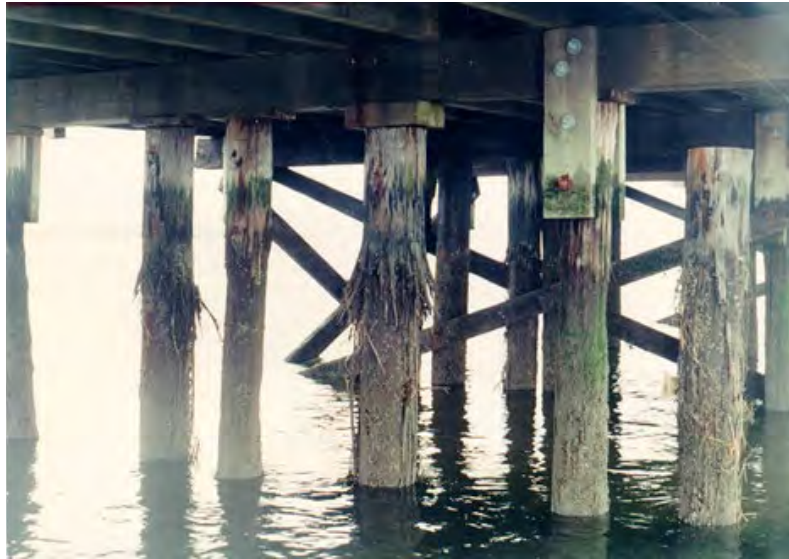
Timber Pile Bent exhibiting Freeze-Thaw Damage above the waterline. Also examples of shims, blocking and splices between the piles and pile cap.
